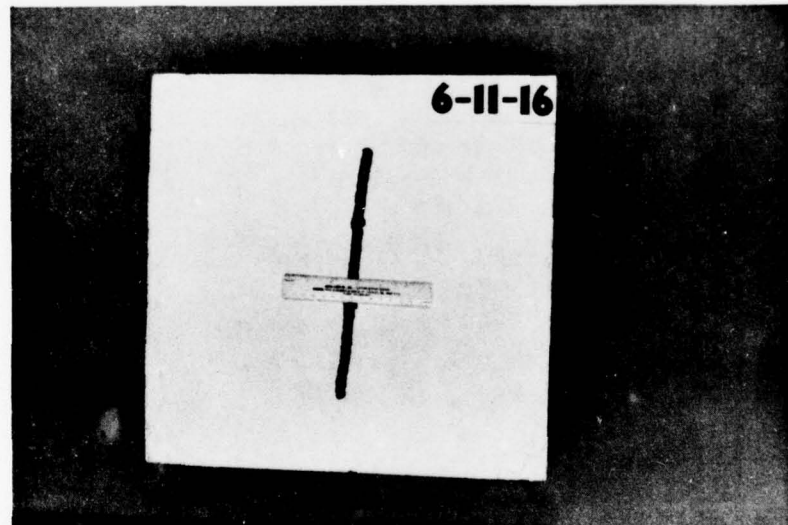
Coated side of grouted concrete slab with 3/8-in. (9.53-mm) crack.
